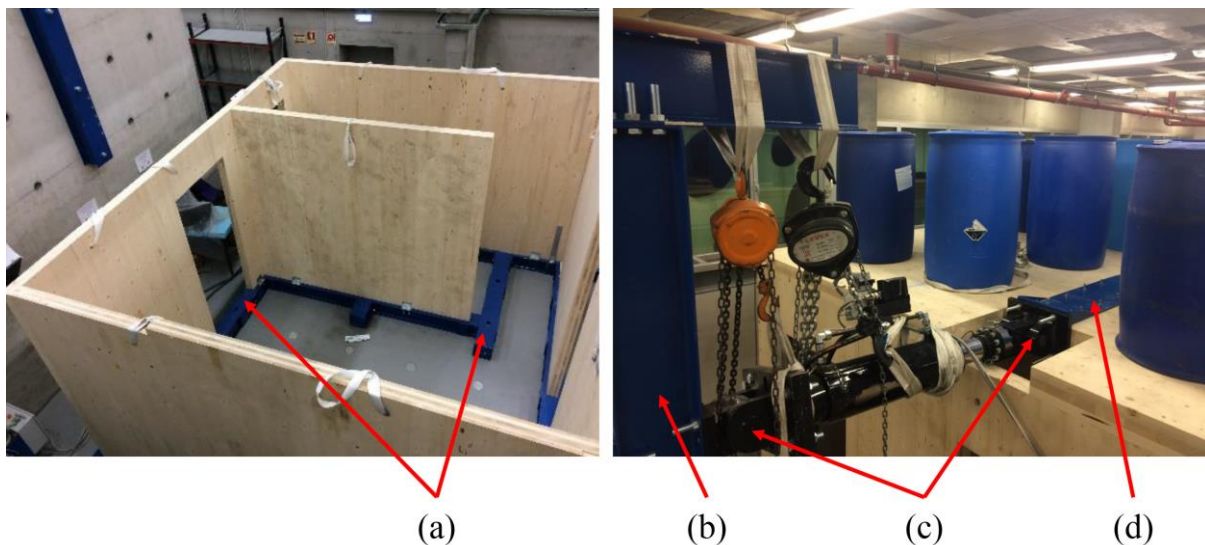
The setup used in the tests: (a) Steel base structure; (b) Steel structure to fix the hydraulic jacks and (c) respective hinges; (d) Steel plate placed on the floors.
